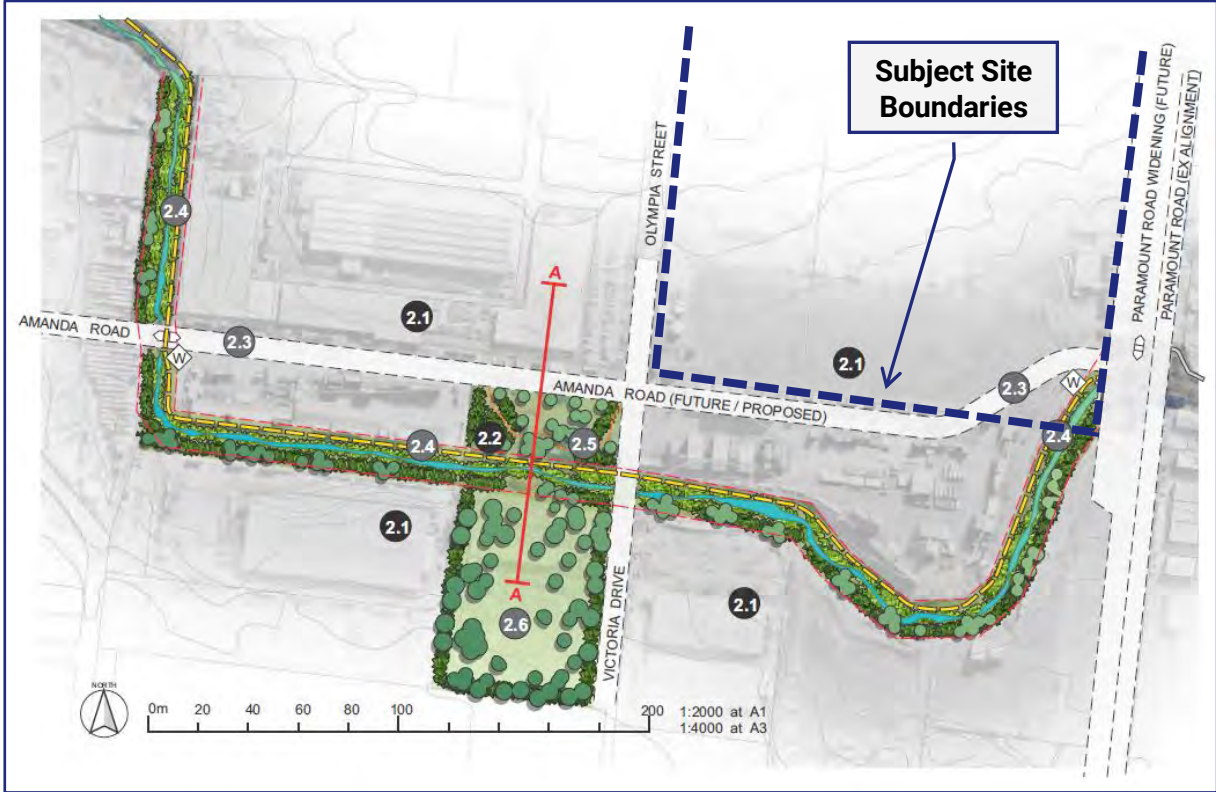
Proposed Future Road along Southern Boundary of Subject Site
